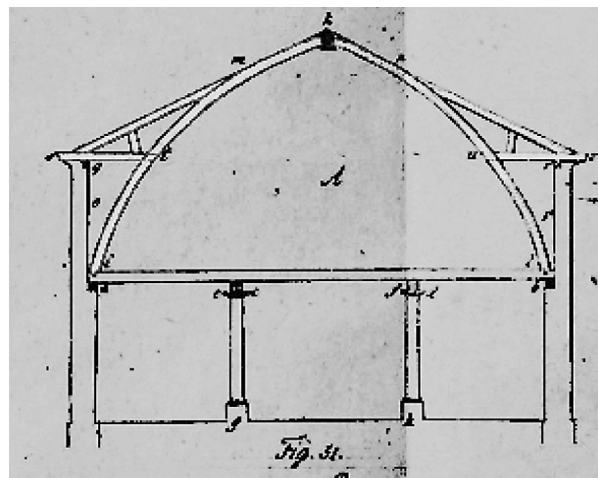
recommended arched roof for storage buildings and packhouses. [11] Fig. 51
